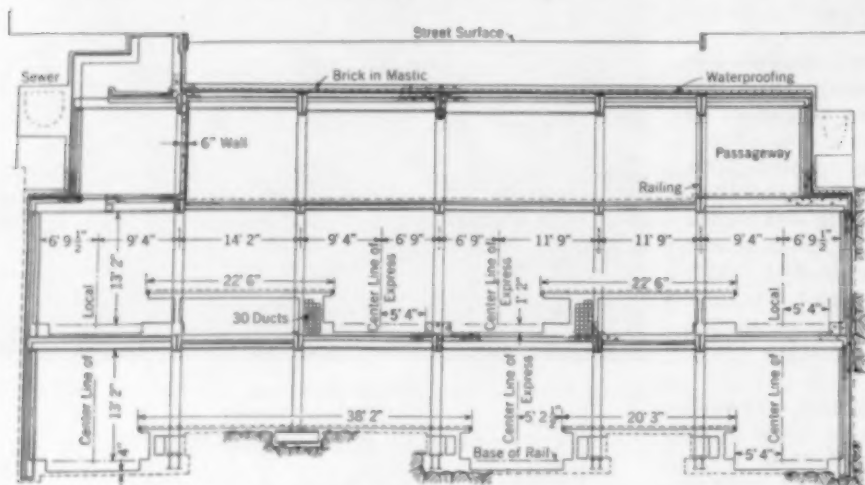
CROSS SECTION THROUGH THREE-STORY SUBWAY STATION AT 145TH STREET AND ST. NICHOLAS AVENUE
